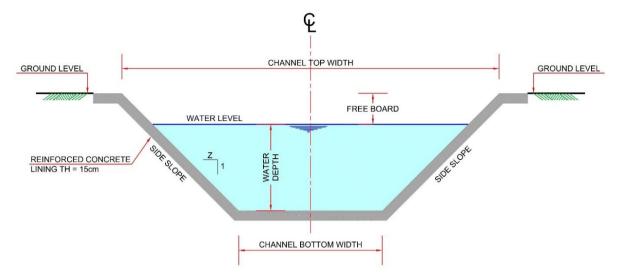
Typical Cross-Section for a Concrete Lined Channel (Bed and Sides) (Source: Consultant, 2022)
